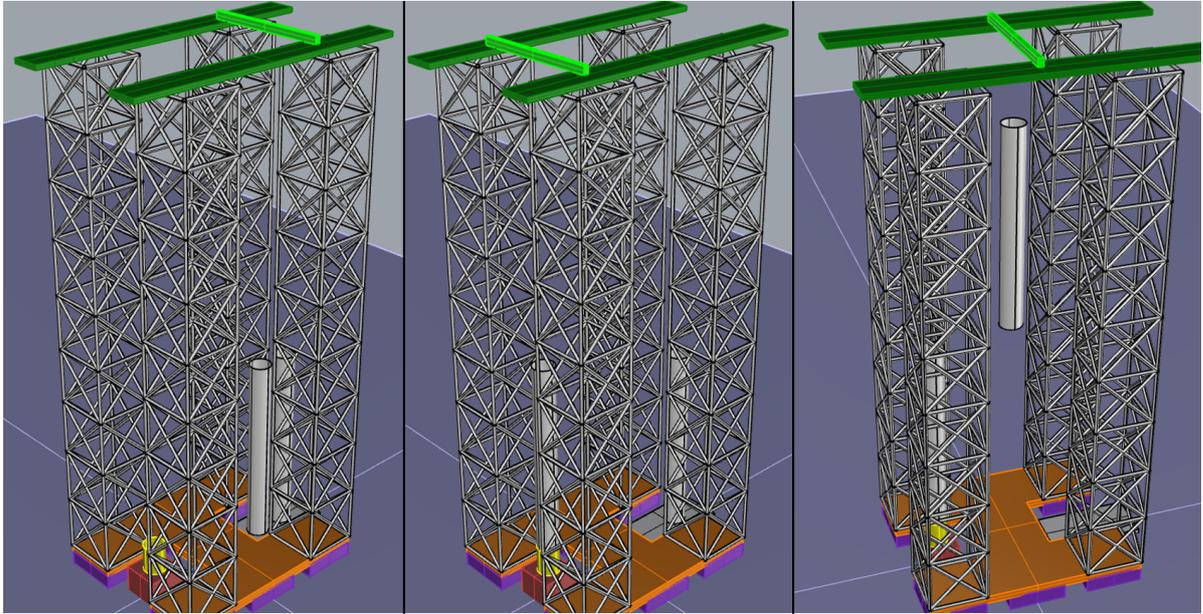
Part one of story board installation using installation tower semi-submersible concept. Left, 2 tower pieces on barge at aft of vessel, Middle first tower piece installation, Right lifting of second tower piece.
